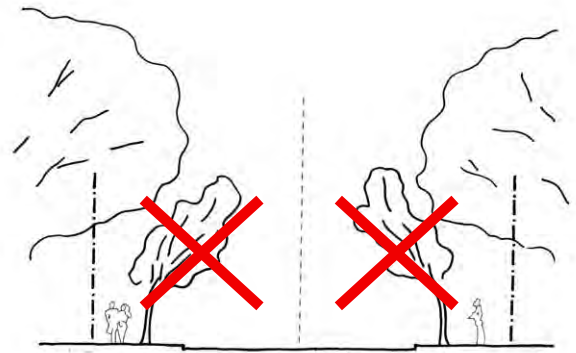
Typical street section with large trees in private gardens or parks and suppressed street trees on both verges.
